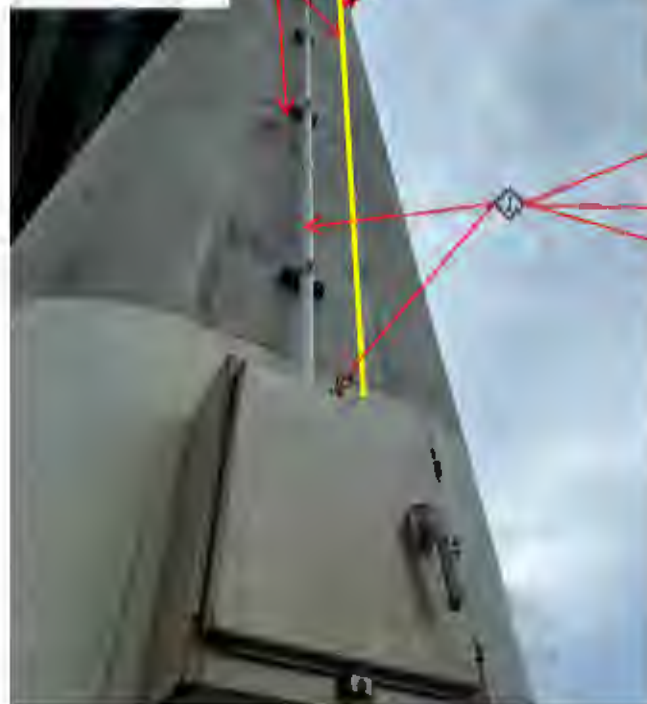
EXISTING ELECTRICAL ENCLOSURE
